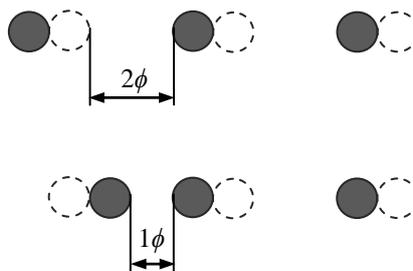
Required minimum distance between lapped bars might have been set to consider deviations such as by mistake reversing two bars at the construction site.
